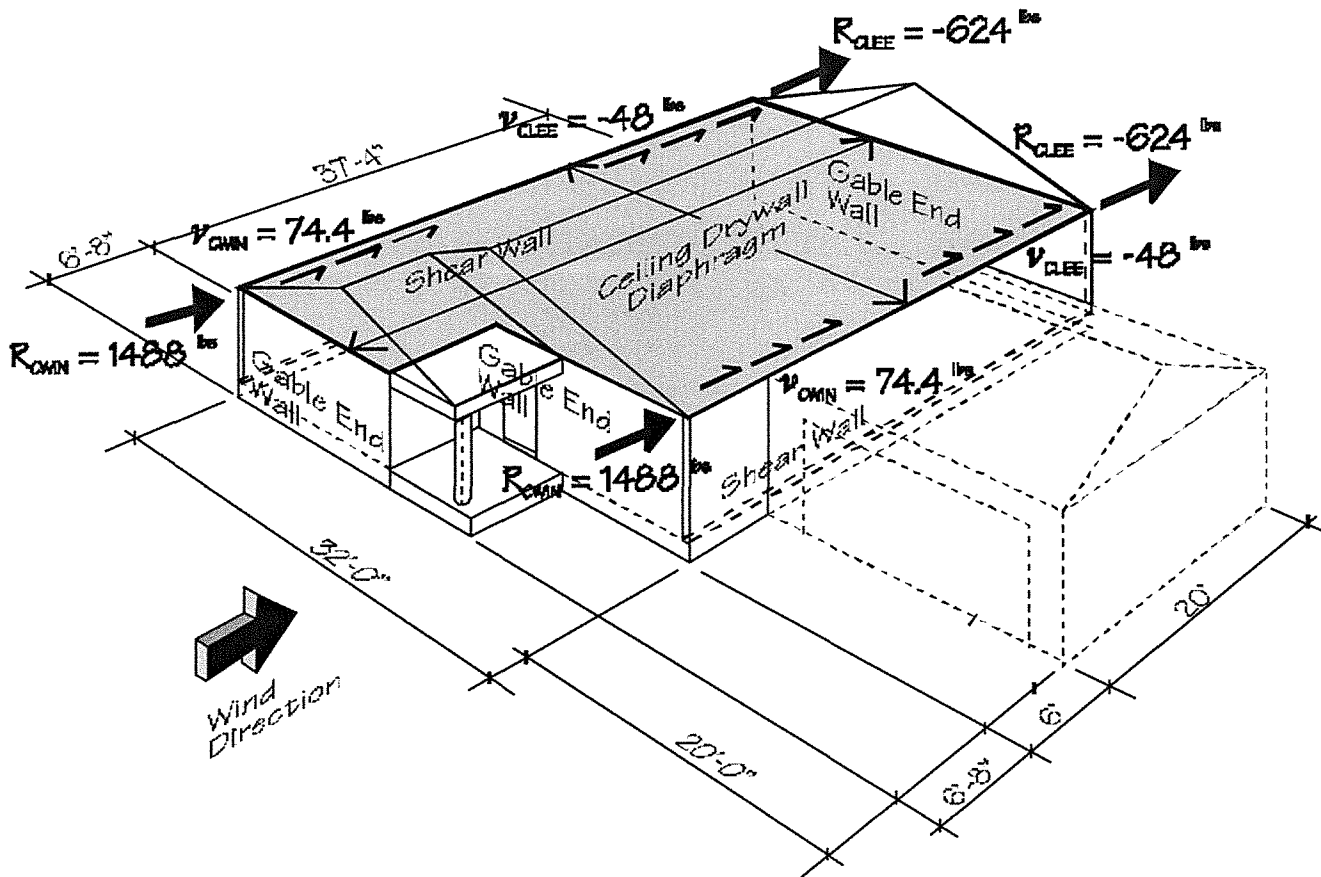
Perspective of One Story Residence Ceiling Diaphragm Stability for Gable End Walls
